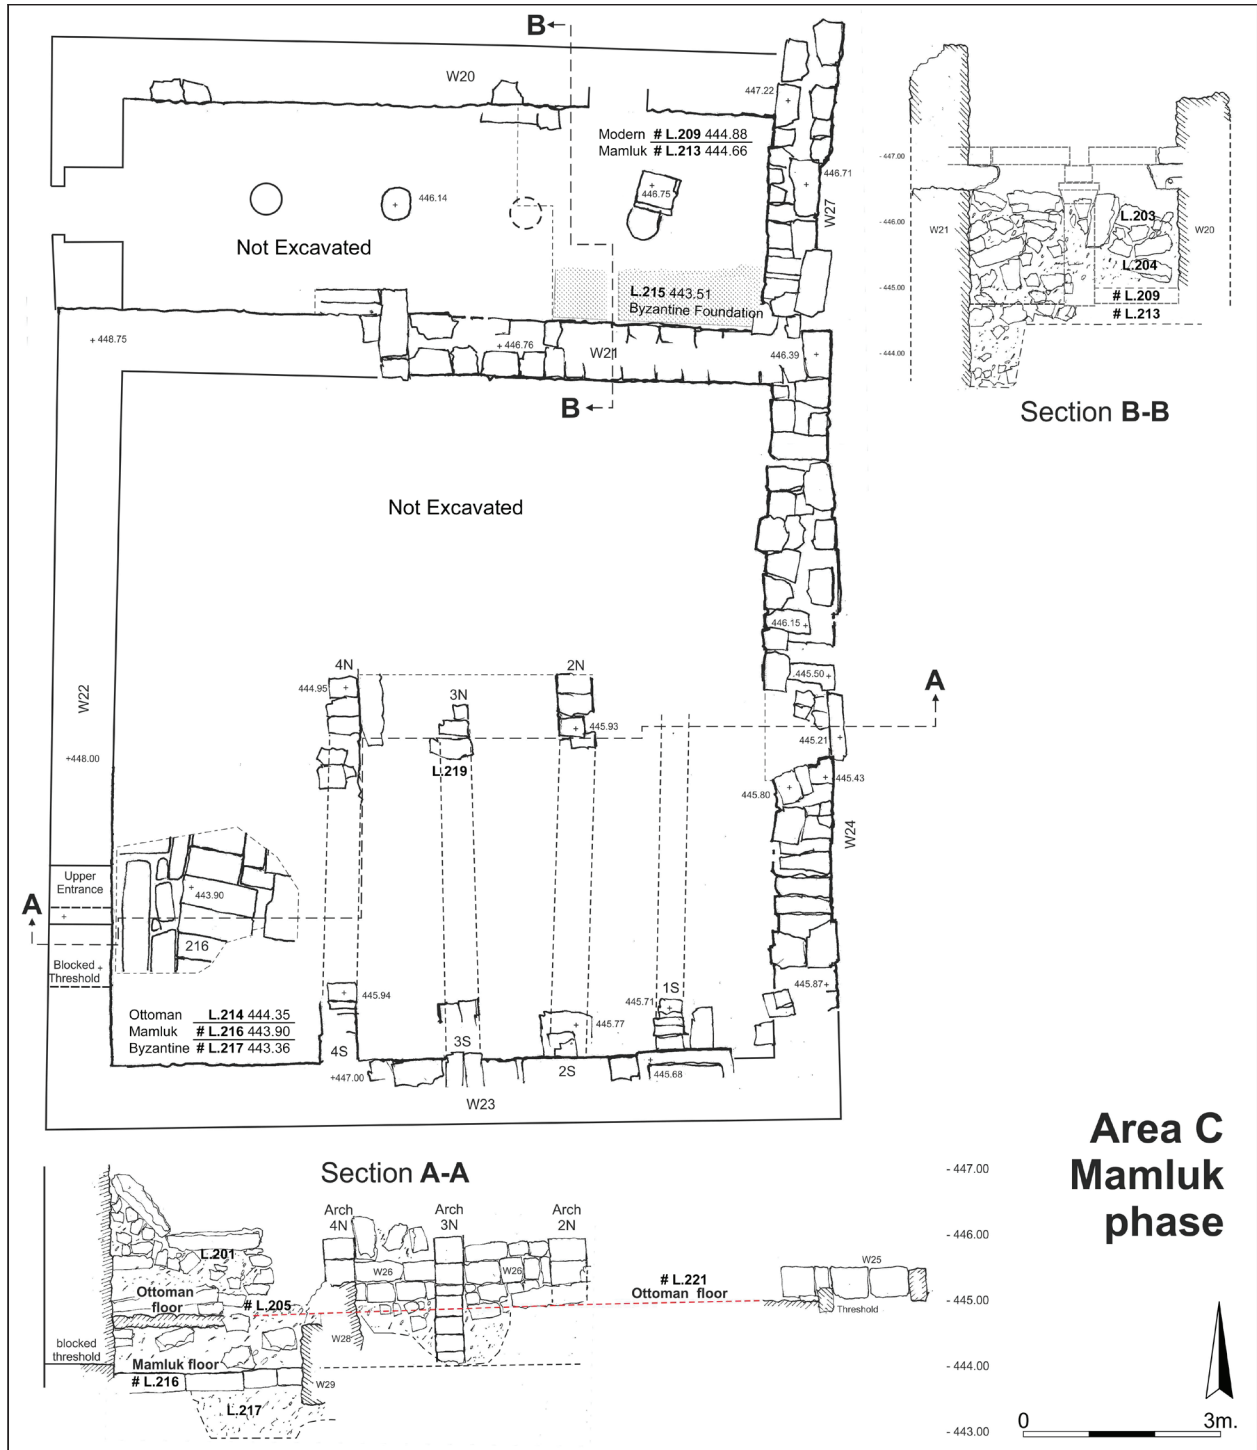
Plan of the Hauranian house. (Jay Rosenberg)
